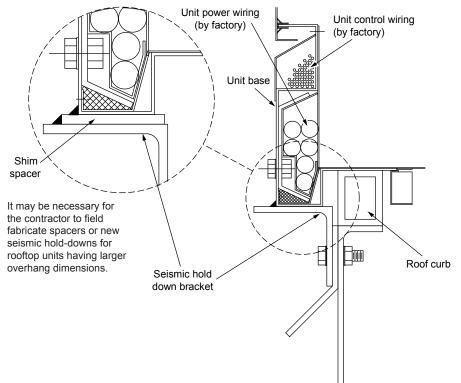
Welding of Hold Down Brackets—Unit Base, Cross-Sectional View
